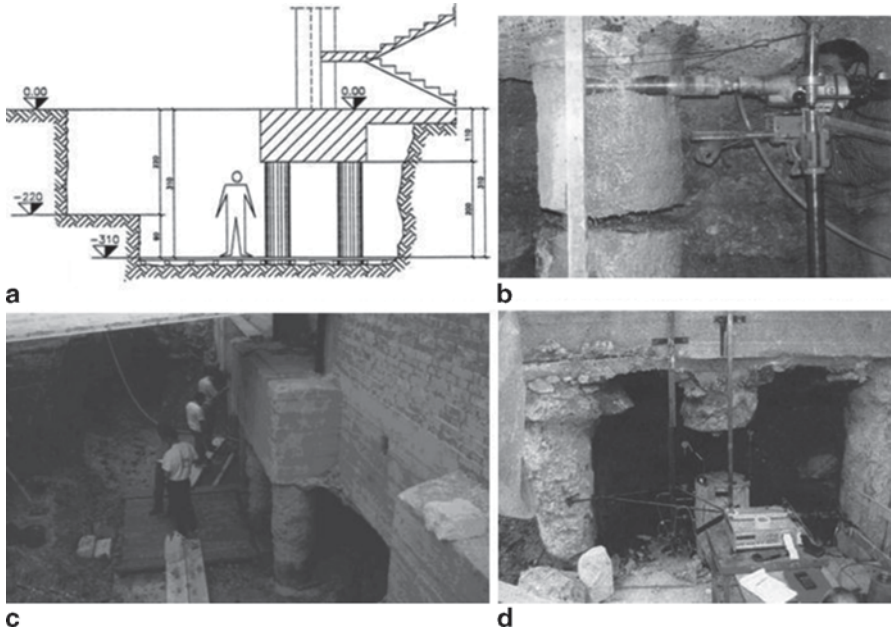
Piled foundation. a section. b Pile cutting. c View of the excavation. d Loading test on pile
